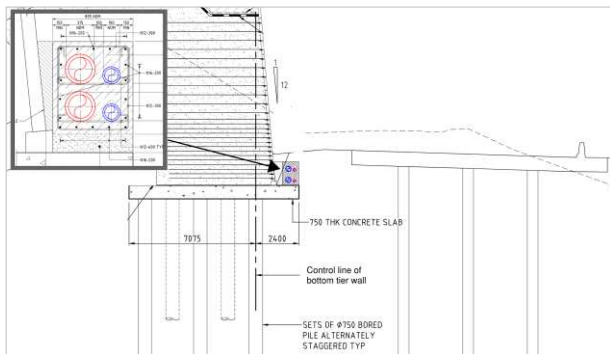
Extended concrete slab supporting two 315 mm diameter deluge pipes and two 180 mm diameter fire hydrant with concrete encasement.
